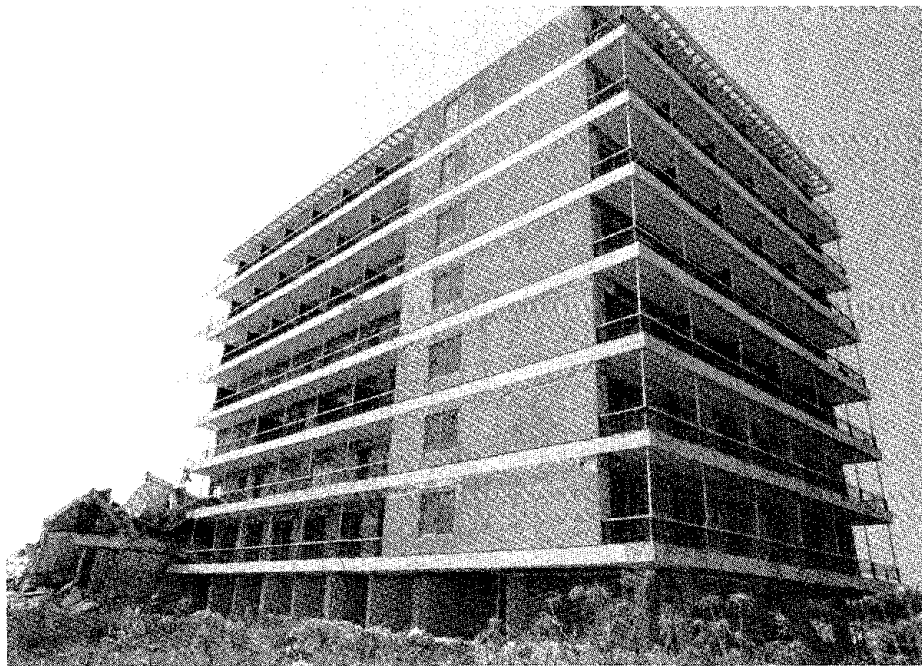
Galaxy Hotel in Vrahati. North view of section III. Columns and walls in the first floor were heavily damaged.
